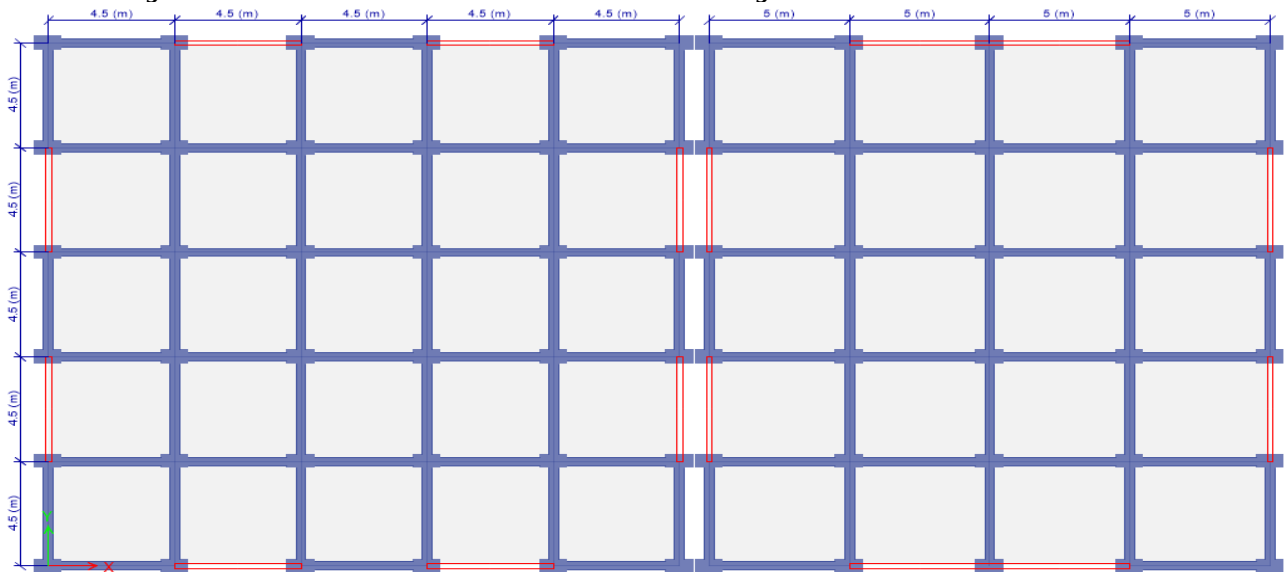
& 5 show the elevation of the buildings without isolator and with isolator, respectively. Figure 6 displays the plan layout of the buildings as well as locations of shear walls and X bracings. Figure 7 shows 3D view of the buildings.
